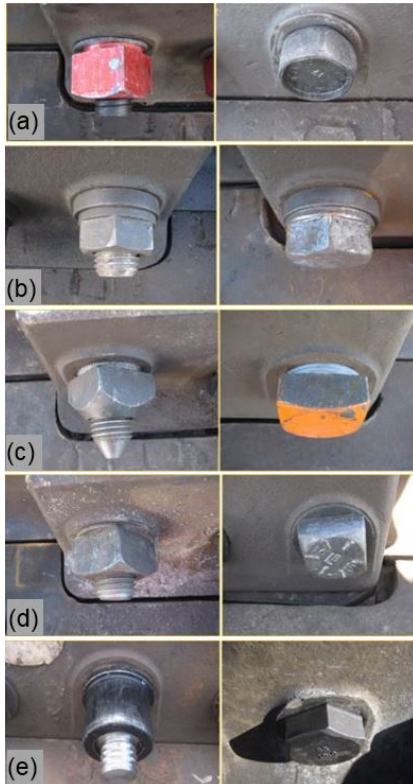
(a) NW Corner – Huck 360 Threaded Bolt; (b) NE Corner – Lewis Bolt & Nut (LB&N) Self-Centering Threaded Bolt; (c) SW Corner – Copper State Threaded Bolt; (d) SE Corner (Phase I) – LB&N Standard Threaded Bolt; (e) SE Corner (Phase II) – Huck Bobtail Lock Bolt.
